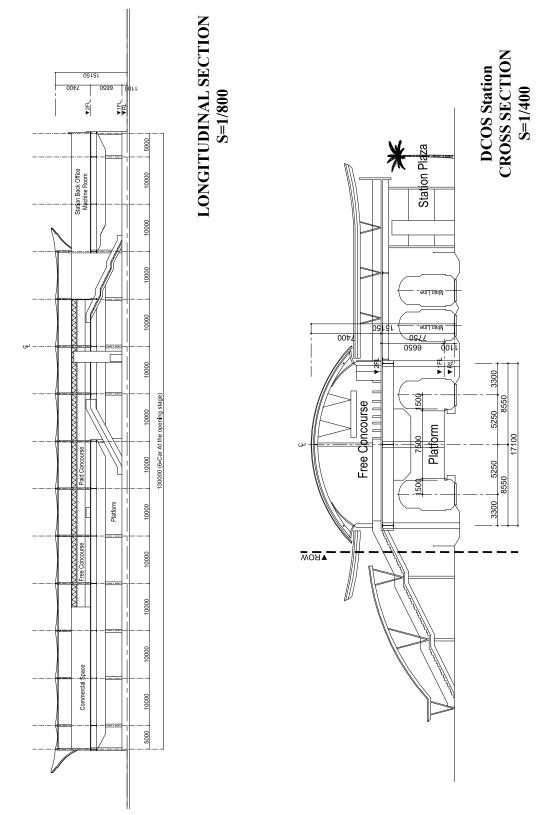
Station Architect Conceptual Plan (DCOS Station)
